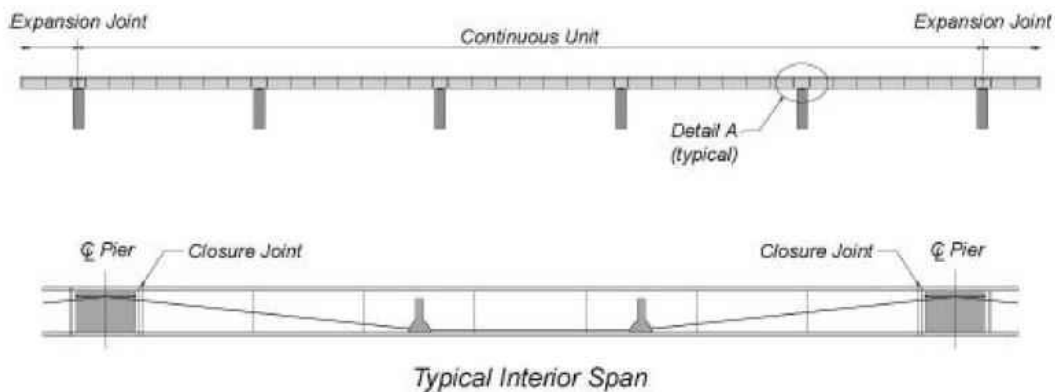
Typical tendon detail for precast segmental span-by-span bridges (FDOT 2002-1)
